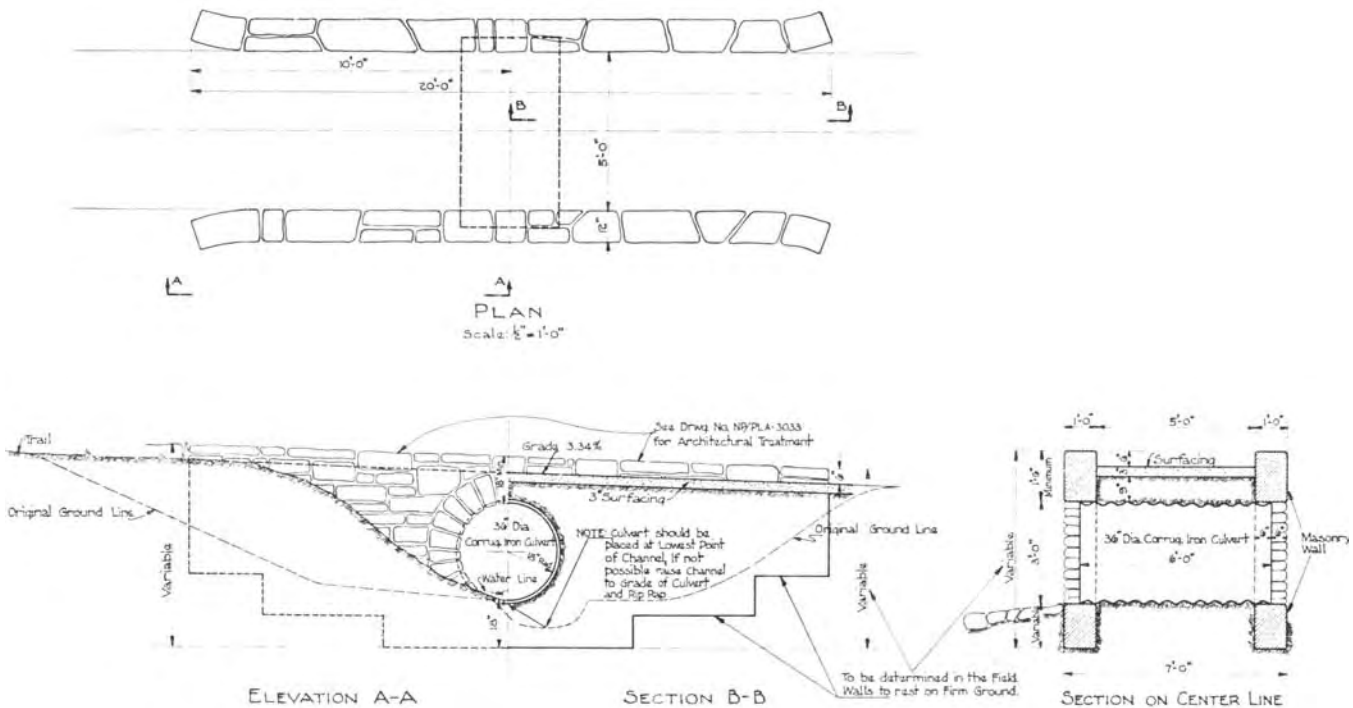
"Proposed Foot Bridge Near Hillside and Pavilion Springs," Drawing NP-PLA-5000, 1935. Design for the small, stone-arch footbridge near Pavilion Springs.
